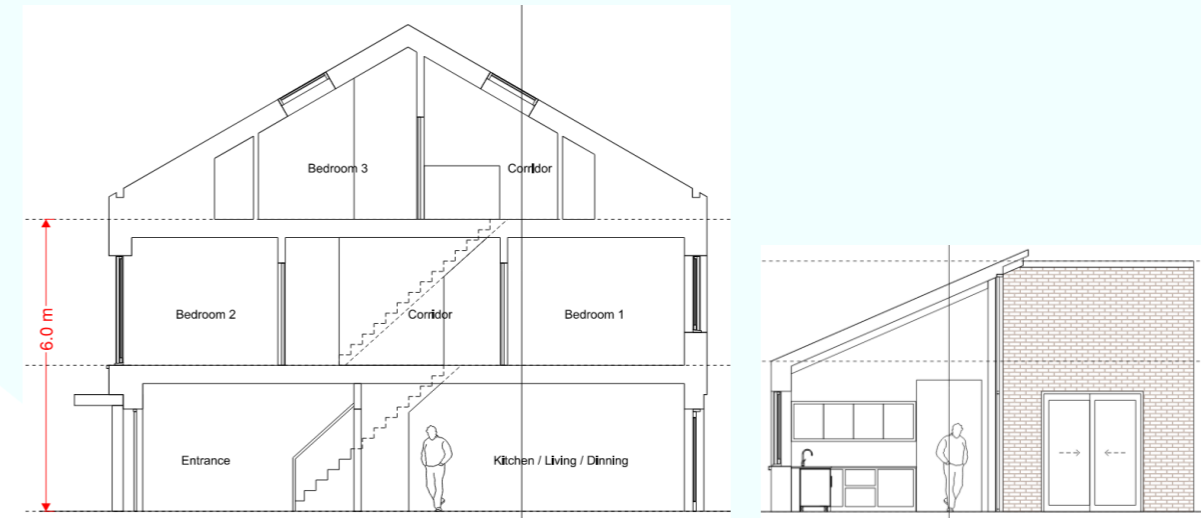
Typical section. House type 1 (left) and house type 2 (right)
